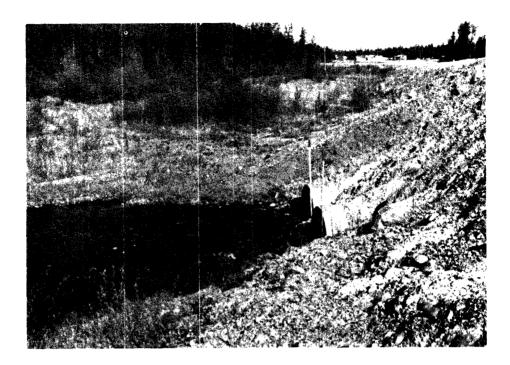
Stream crossing, well vegetated shorelands. Alaska Highway, km 1014. Reconstructed section.
